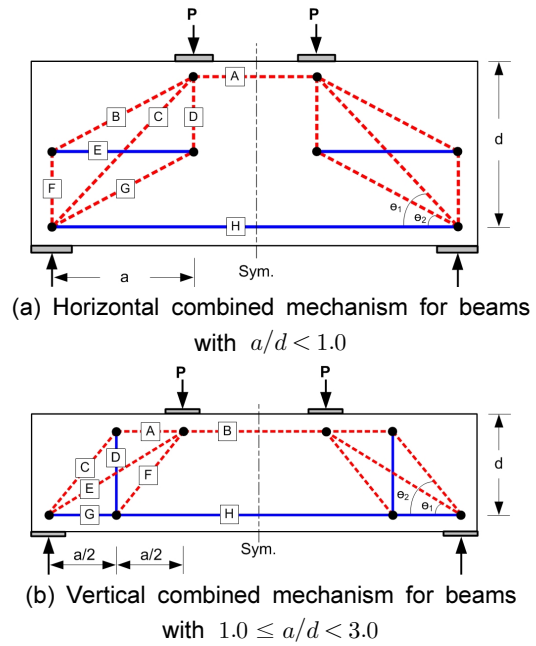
Proposed indeterminate strut-tie models for reinforced concrete beams
